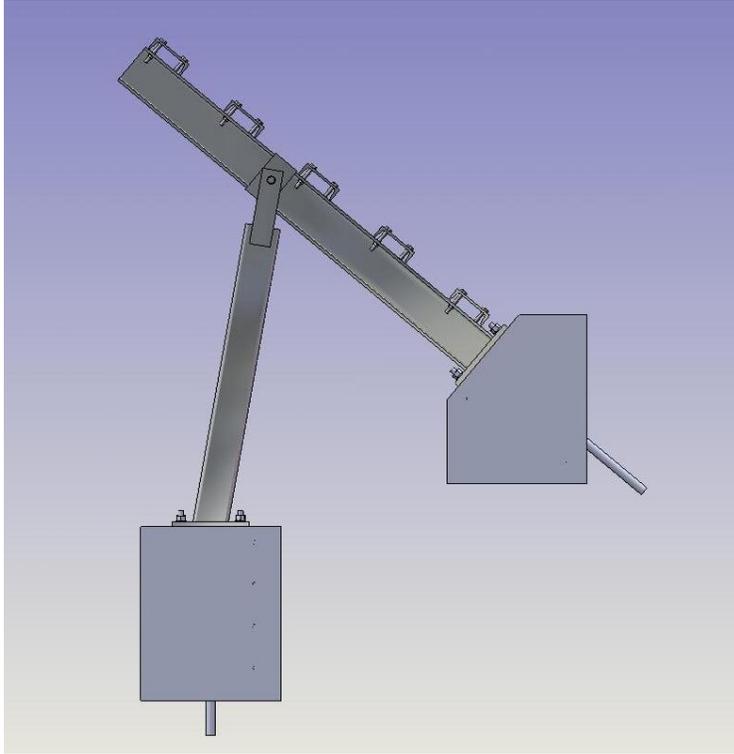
Rendered sideview of the snow supporting structure on CIP concrete footings.
